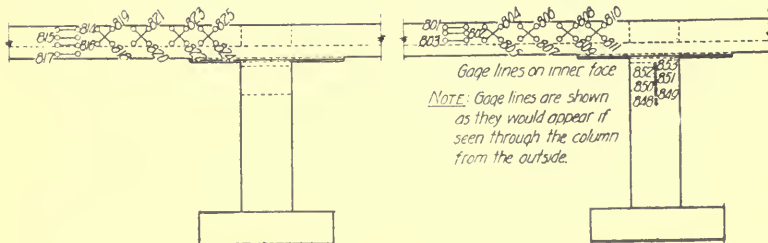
LOCATION OF GAGE LINES ON COLUMN Z AND MARGINAL BEAMS OF SLAB S.
